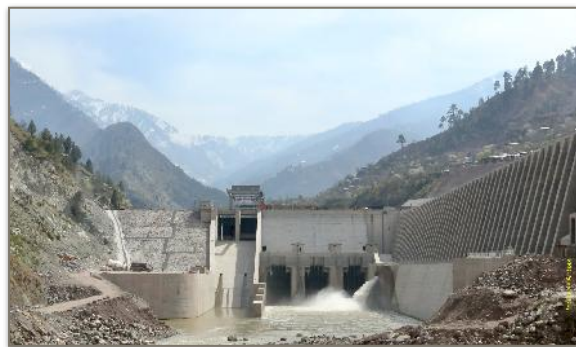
Composite structure of dam wall. Gates and spillway is in concrete while fault line is under the clay-core rock-wall
